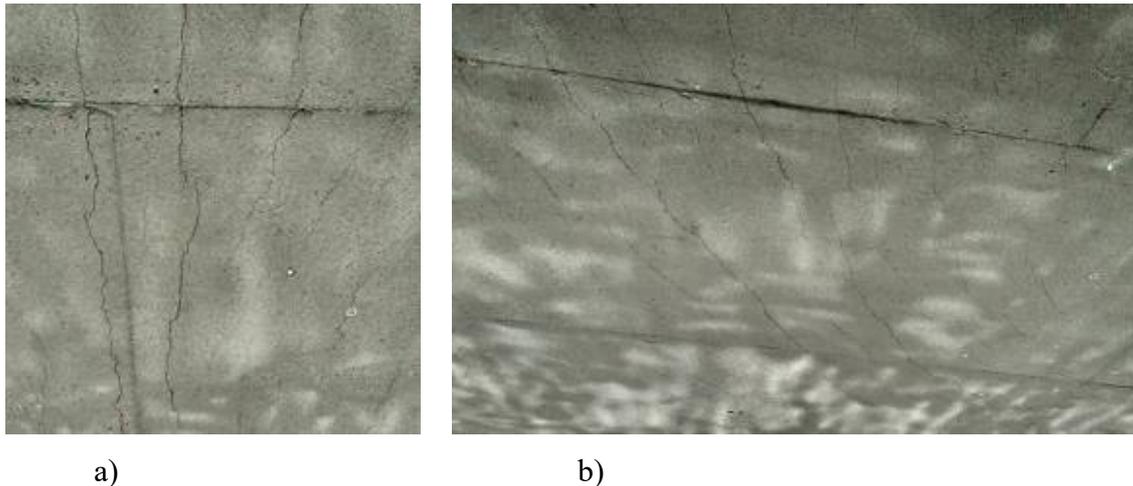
Longitudinal (a) and bending (b) cracks on the surface of the floor slab
